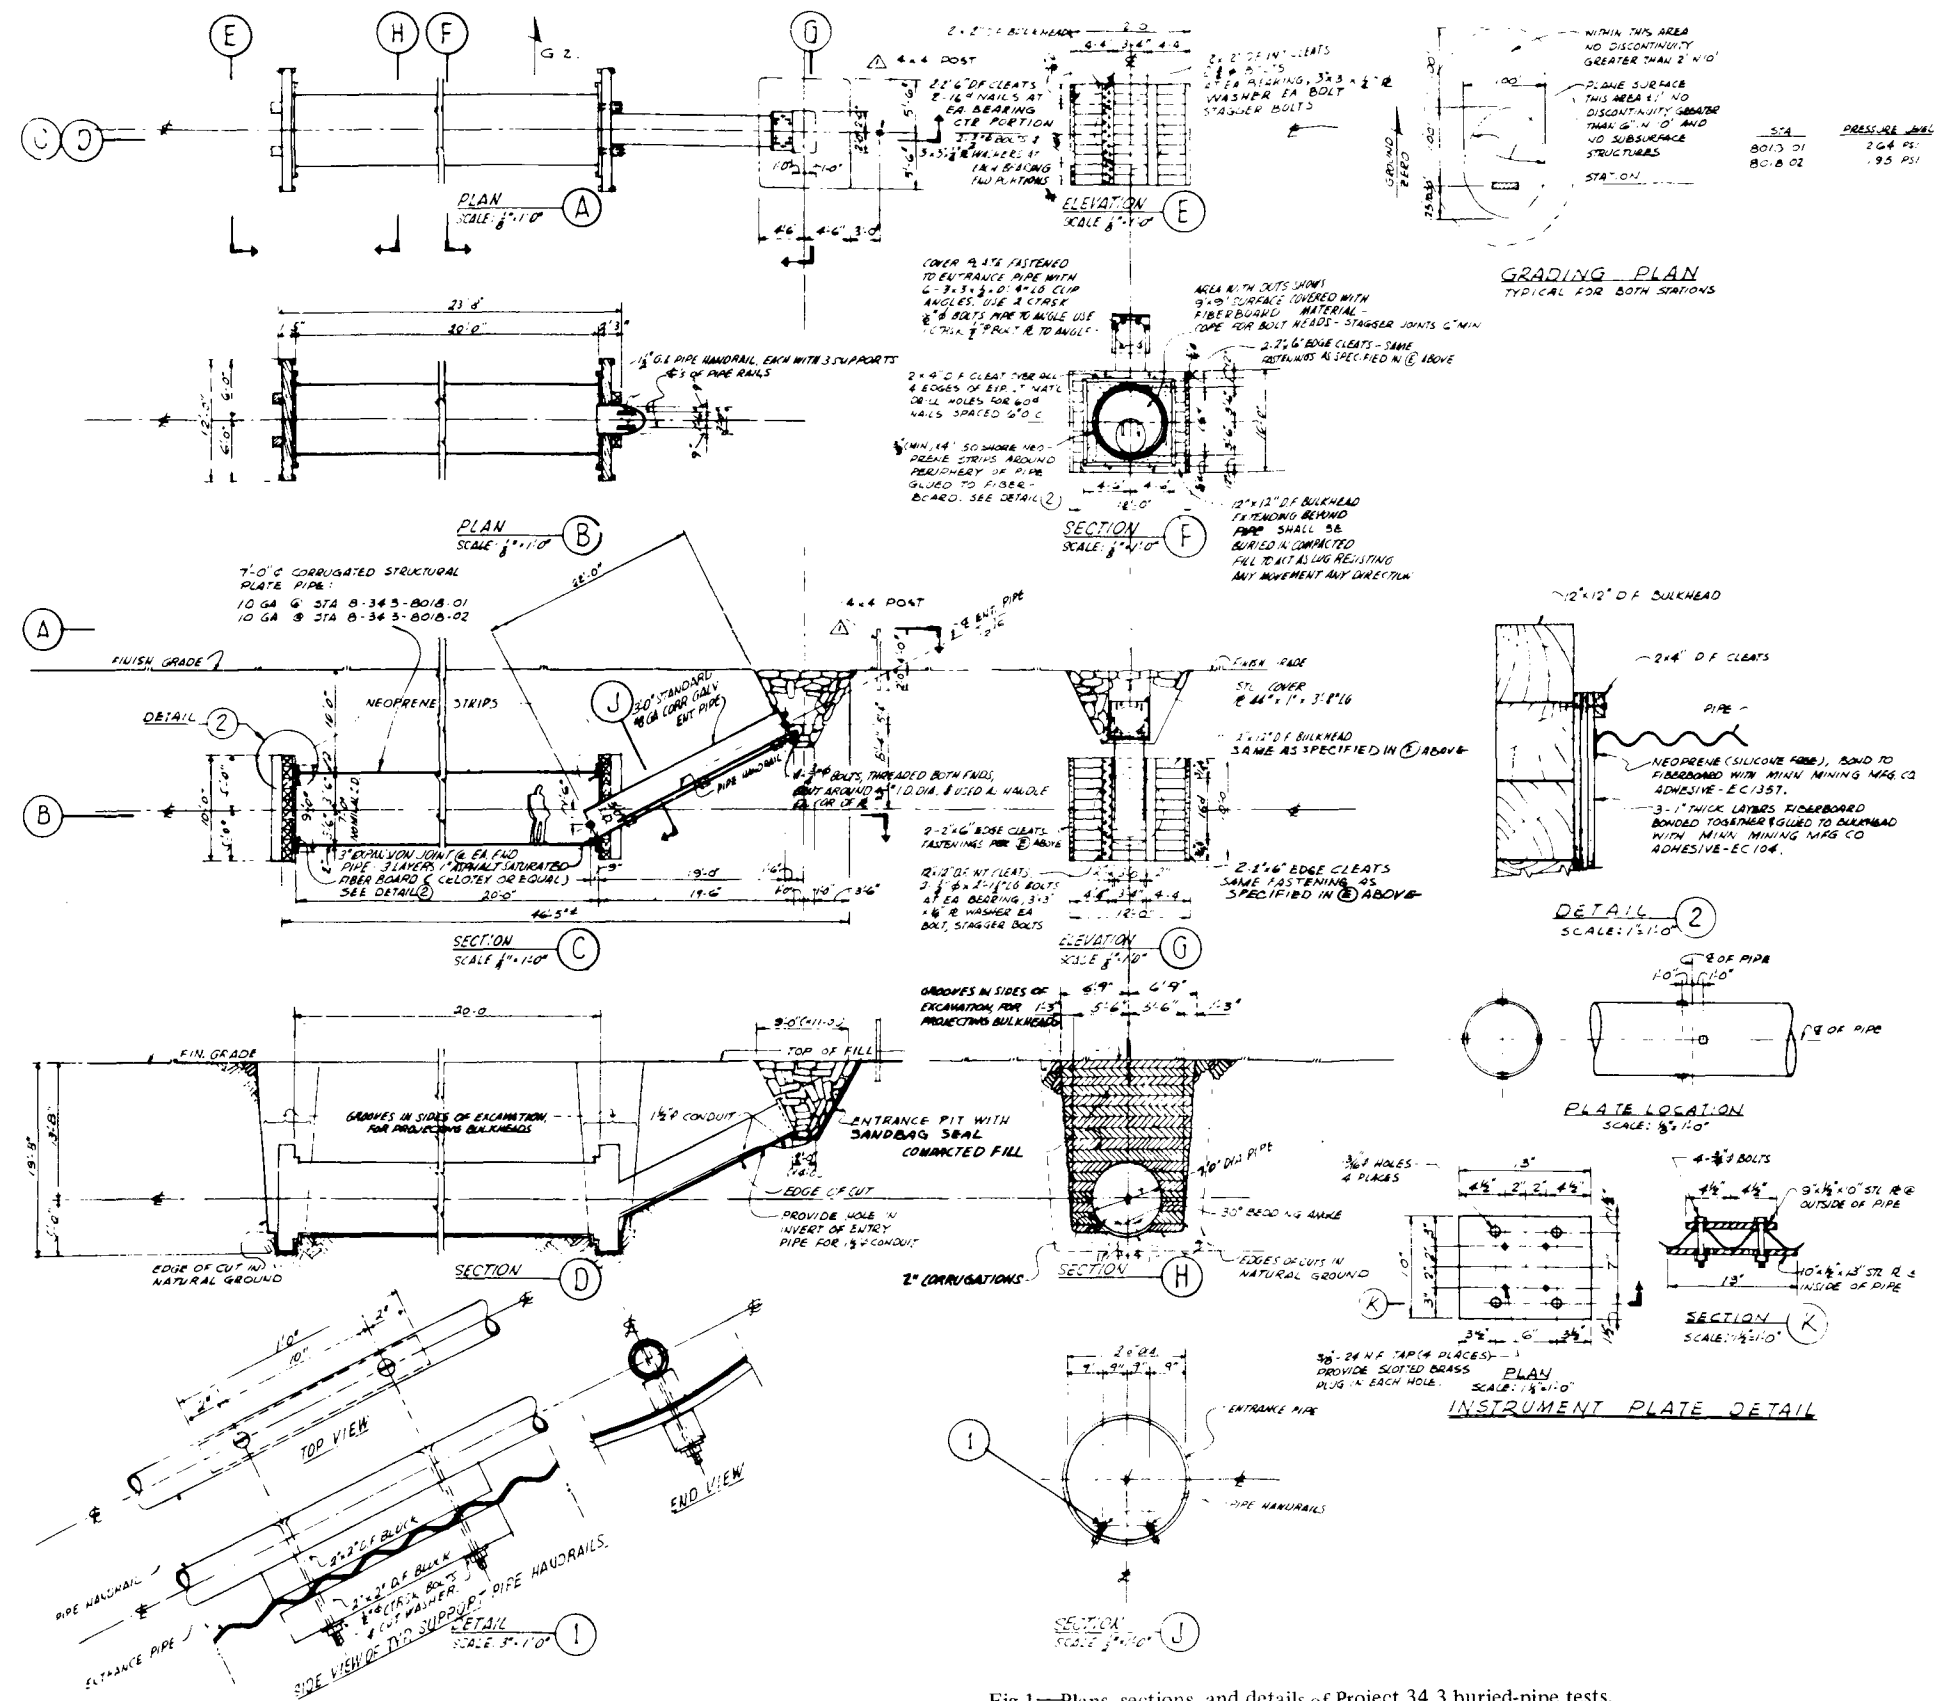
Plans, sections, and details of Project 34.3 buried-pipe tests.
